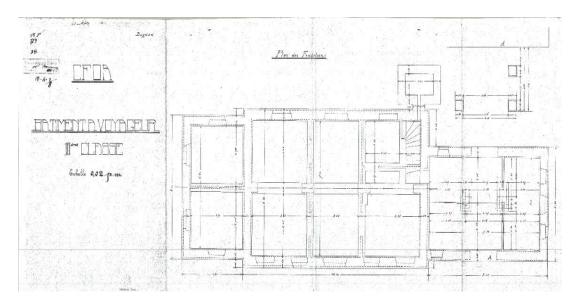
CFOA Company IIIrd Class project / Foundation plan
